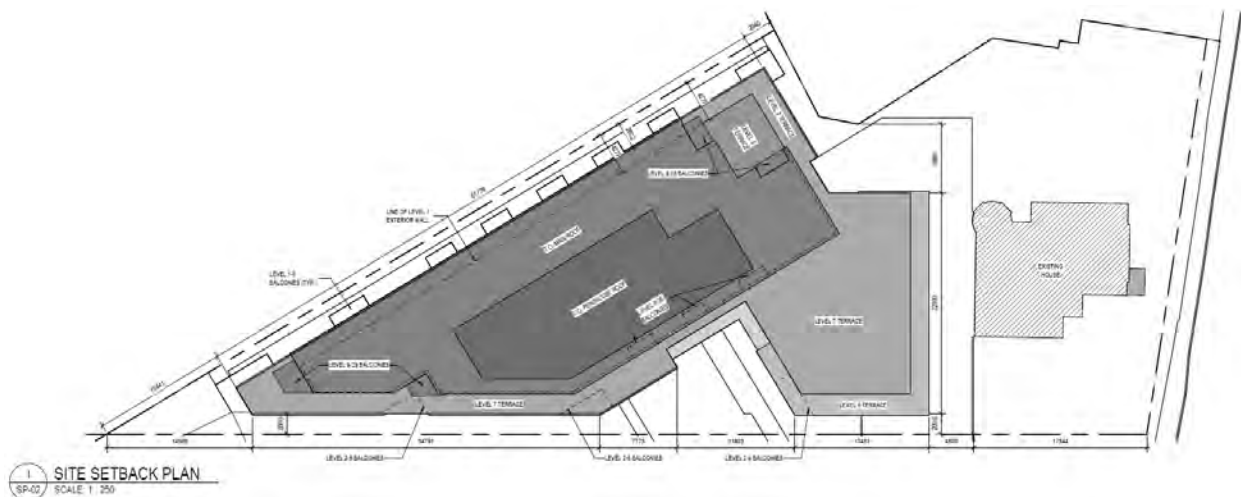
Site Plan, showing demolished structure in hatched outline, (Project1 Studio, 29.04.24)
